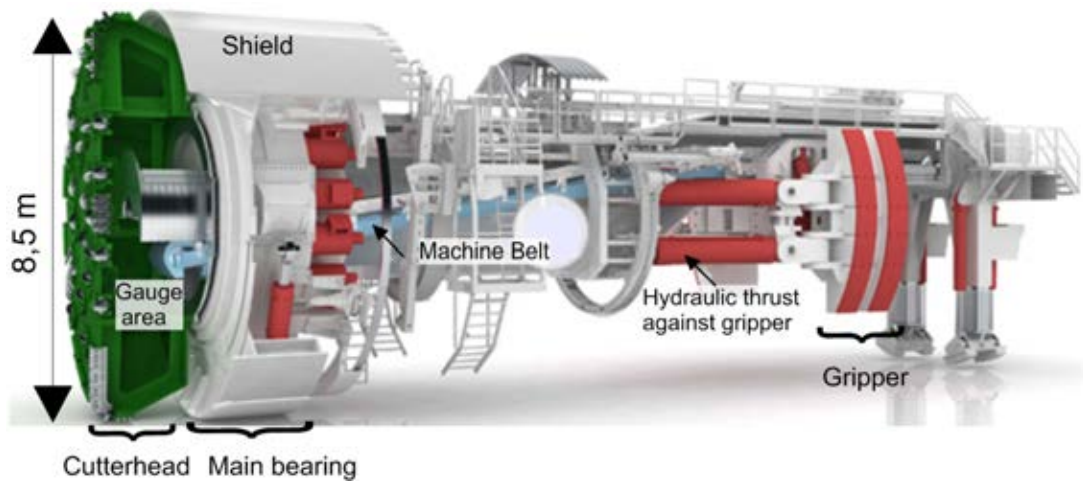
Gripper TBM @ Herrenknecht.com
